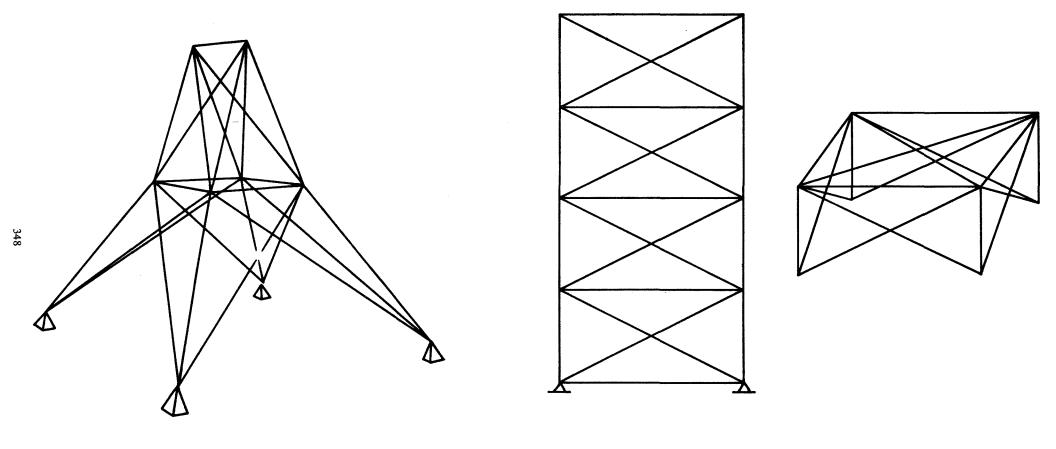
Typical examples of pin-jointed frame problems solved by reduced geometric programming
